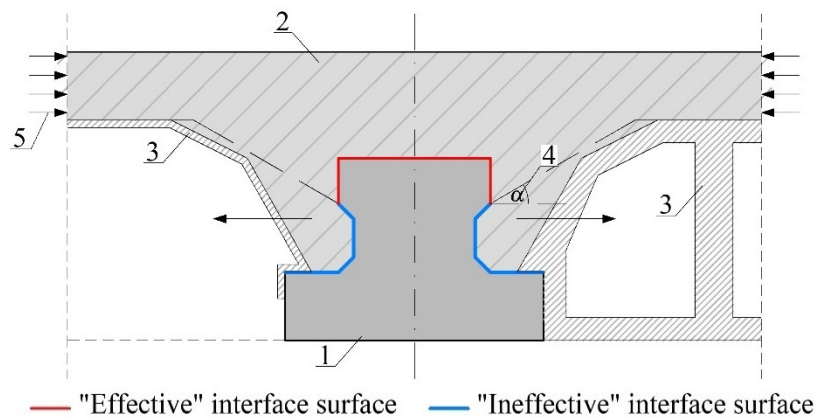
Proposed concept for determining the interface area: 1- precast, 2- concrete topping, 3- block or light infill, 4- the angle of the line, 5- lateral restraint
